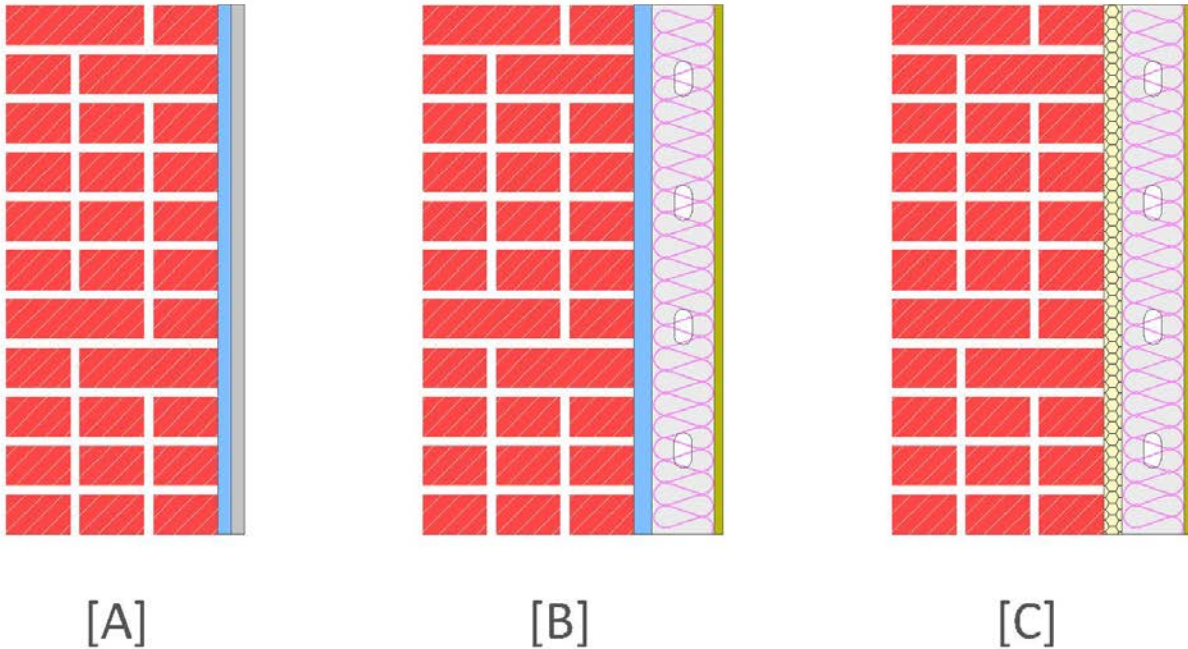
Cross sections of the 12-in.-thick brick walls evaluated: (A) uninsulated, interior plaster finish; (B) 1-in. air gap, 2 × 4 steel studs with R-13 fiberglass batt insulation and gypsum board interior finish; and (C) 1-in. R-5 foam, 2 × 4 steel studs with R-13 fiberglass batt insulation and gypsum board interior finish
